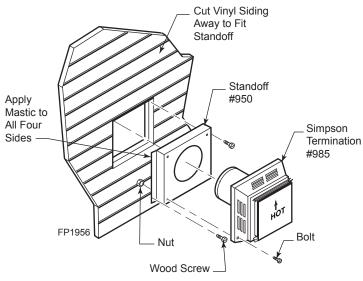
Install Simpson/Selkirk Vinyl Siding Standoff and Termination
